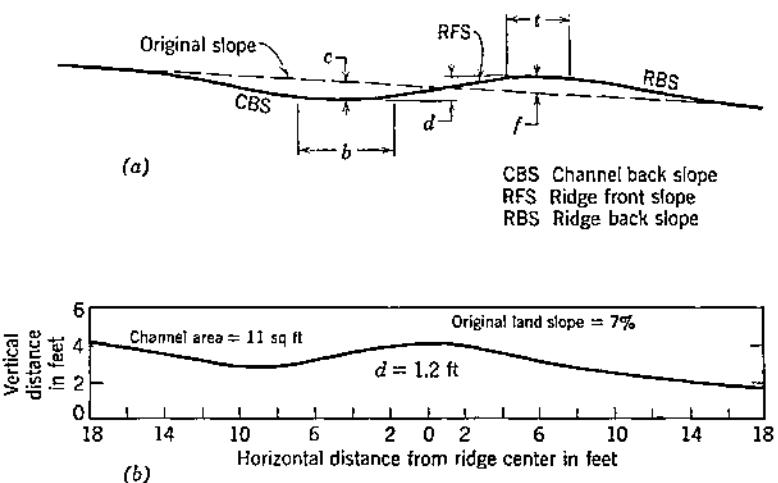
Typical terrace cross sections. (a) Design cross section and (b) cross section after 10 years of farming. (Redrawn from Smith and others.¹²)
